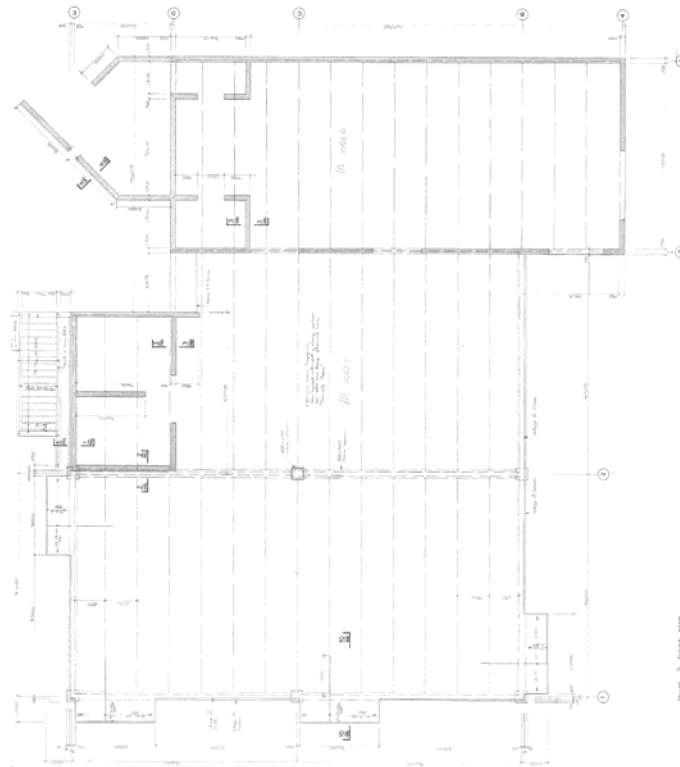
New Building for the Wakatipu Club (1976) – First Floor Plan
